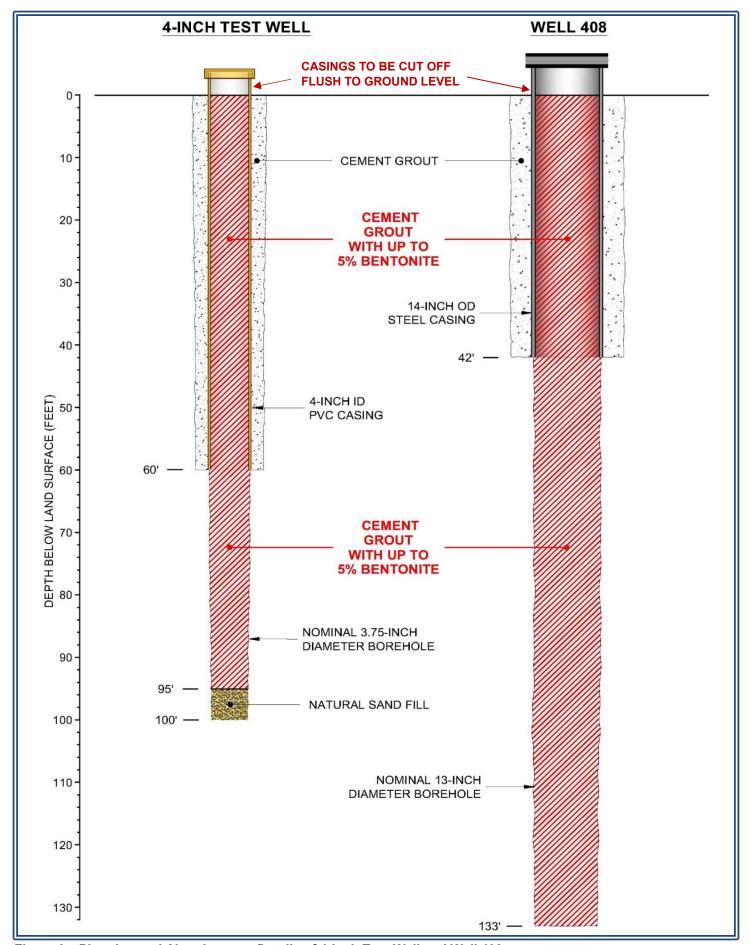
Plugging and Abandonment Details of 4-Inch Test Well and Well 408
